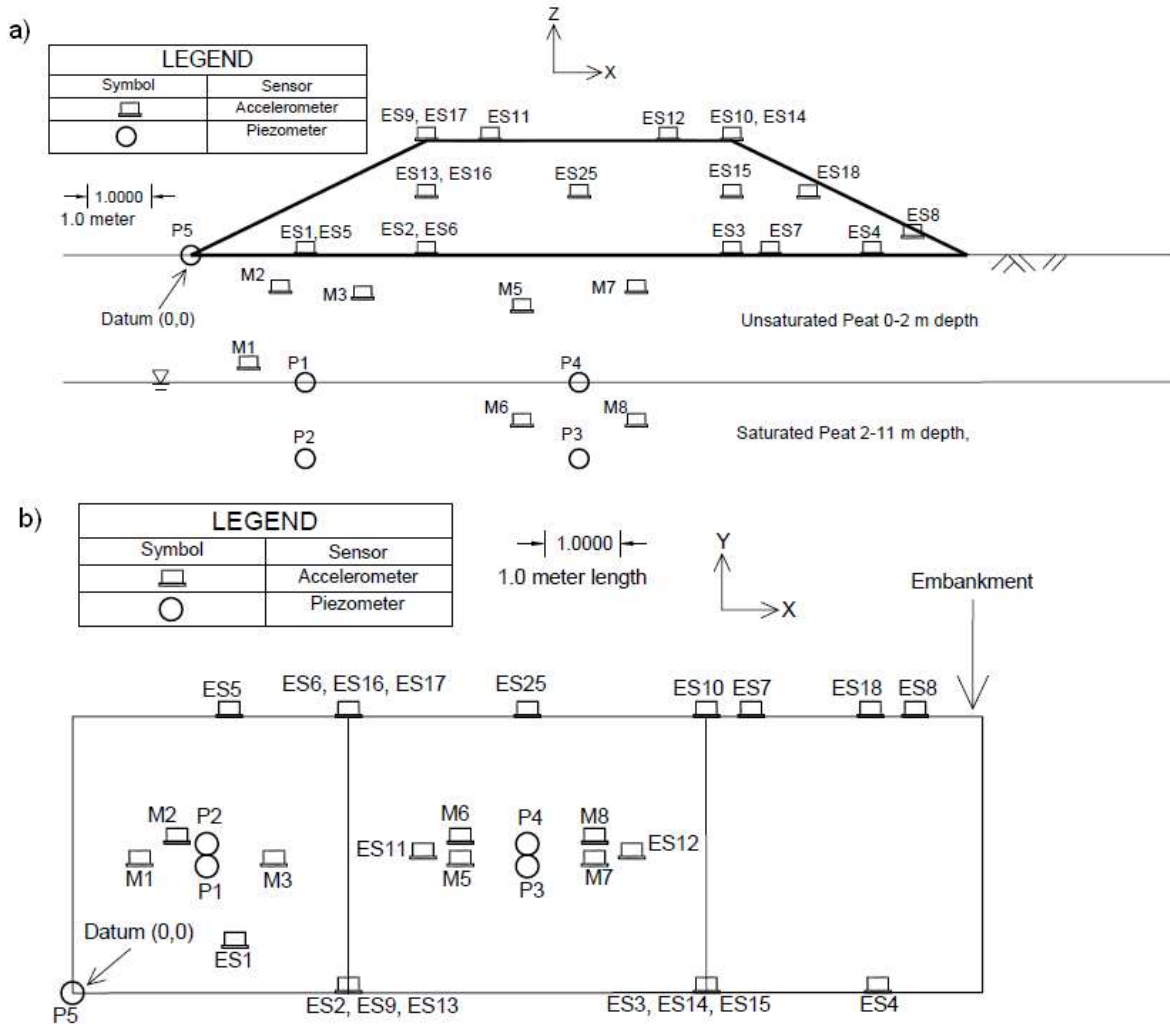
(a) Elevation and (b) plan view of the sensor layout used during the 2012 test. Shaker sketch omitted for clarity.
